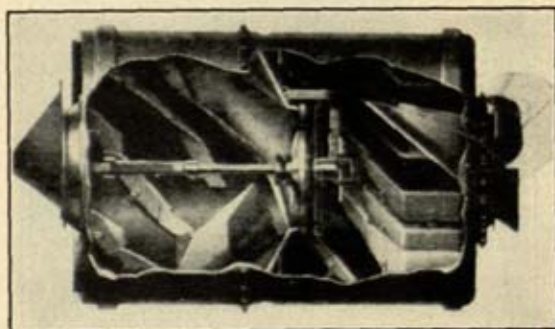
Section through a double-drum paving mixer. (Chain Belt Co.)
